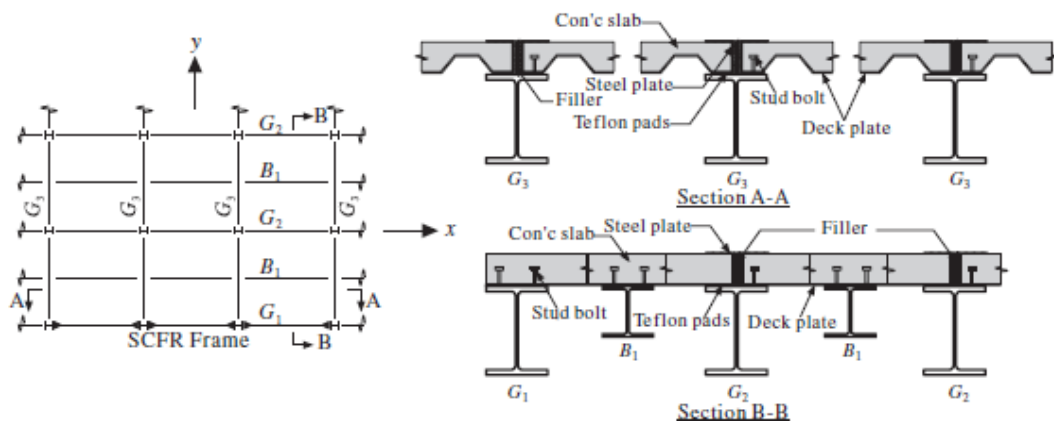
Detailing between concrete slab and SC-MRF to eliminate the restraining effect of slabs (Kim and Christopoulos 2009b).
